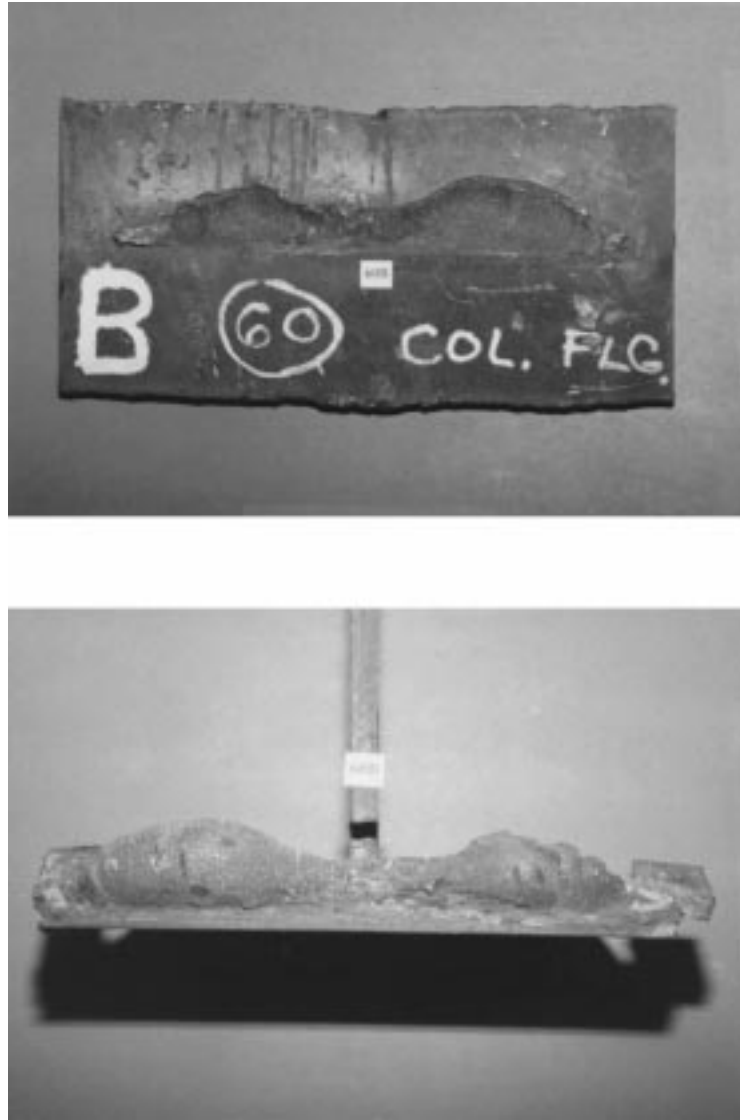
Fracture surfaces of a typical beam-flange-to-column joint of a WSMF that fractured in the Northridge earthquake, showing the lack-of-fusion defect in the center of the weld.
